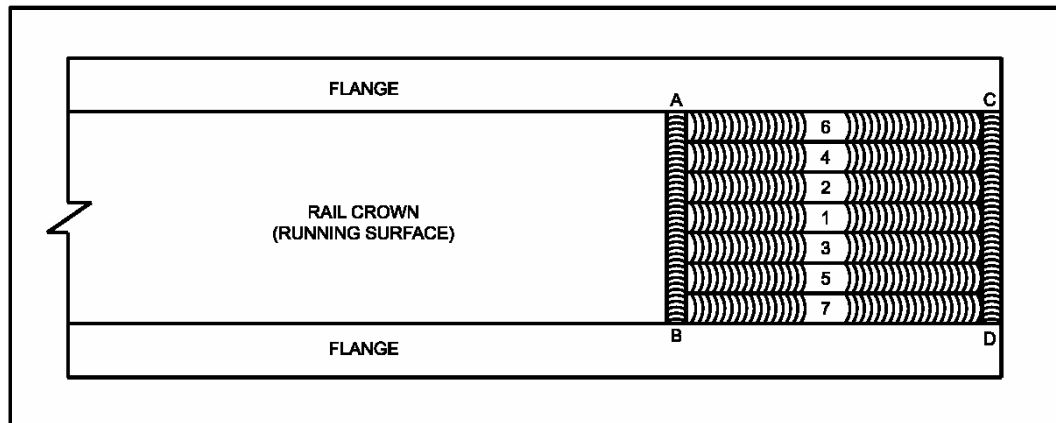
Staggered welding method for wheel-spin burns (except for semi-automatic welding processes).
